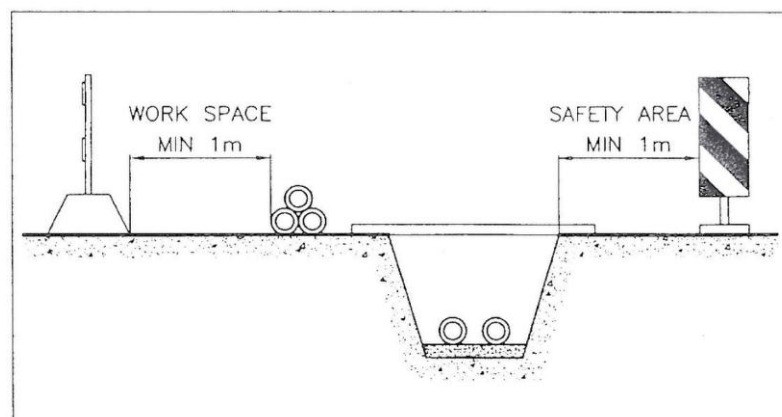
Pipework Installation Working Space (image courtesy image courtesy District Heating Handbook, EDHPMA)
